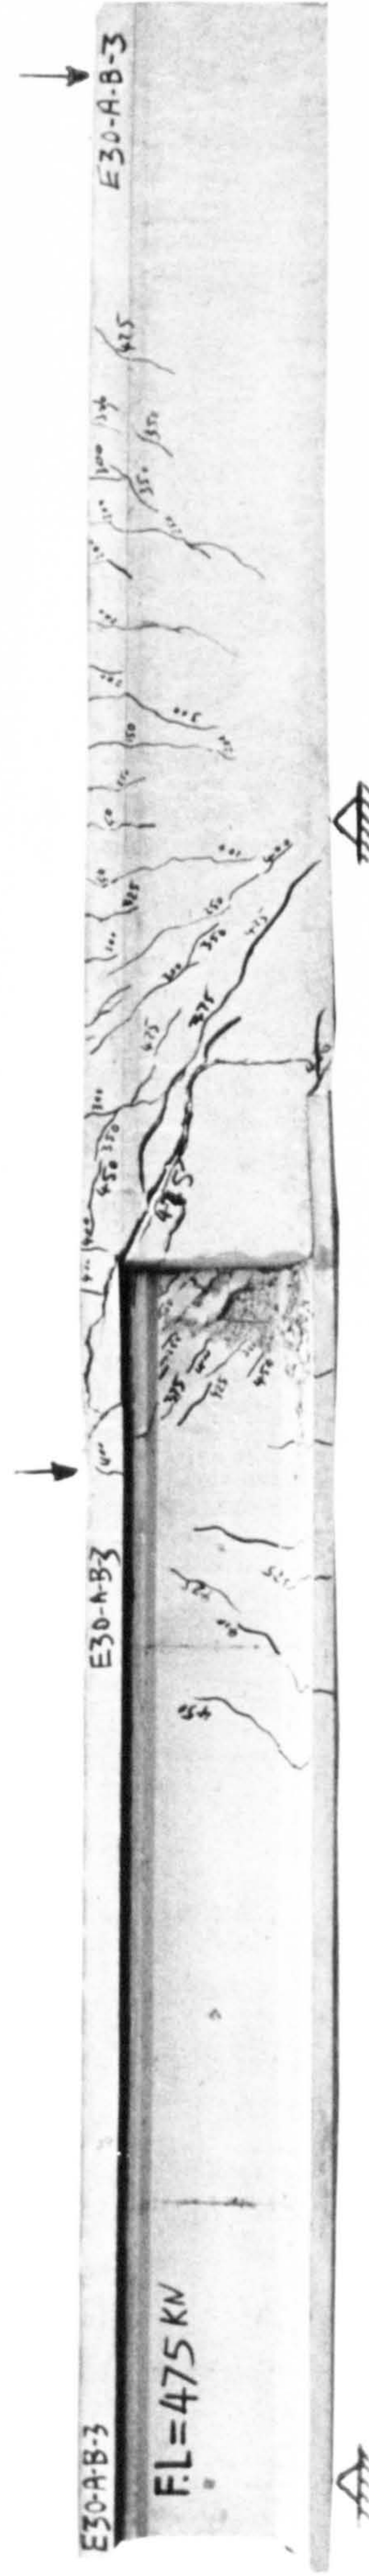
Longitudinal Elevation of Beam E30AB3 After Failure
